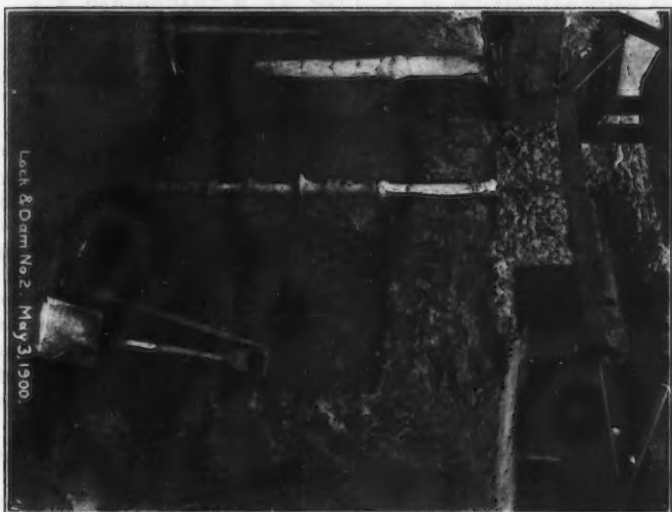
WHEN EXCAVATION HAD PROCEEDED TO A DEPTH OF 6 FEET.
